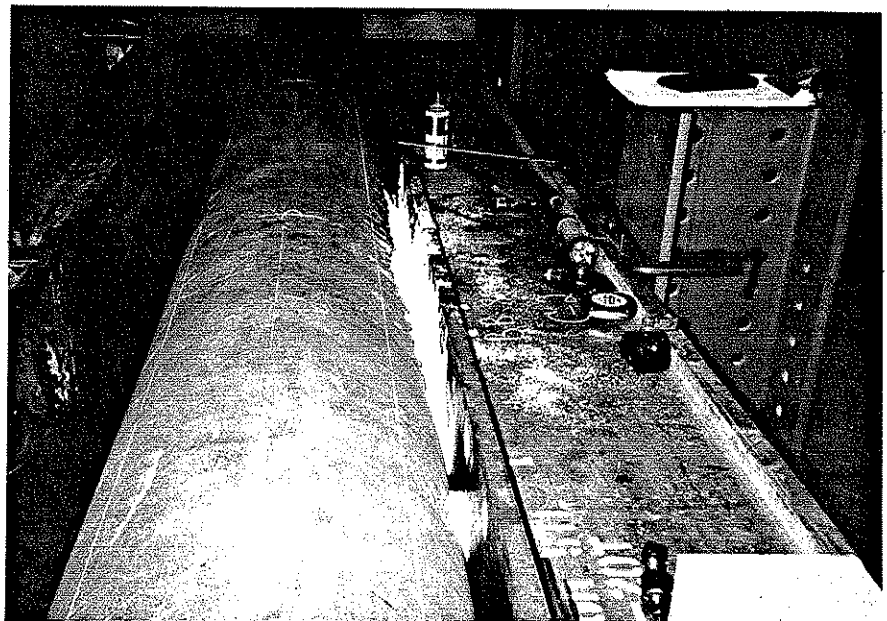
Instrumentation used for Denting with Hydraulic Jack.
